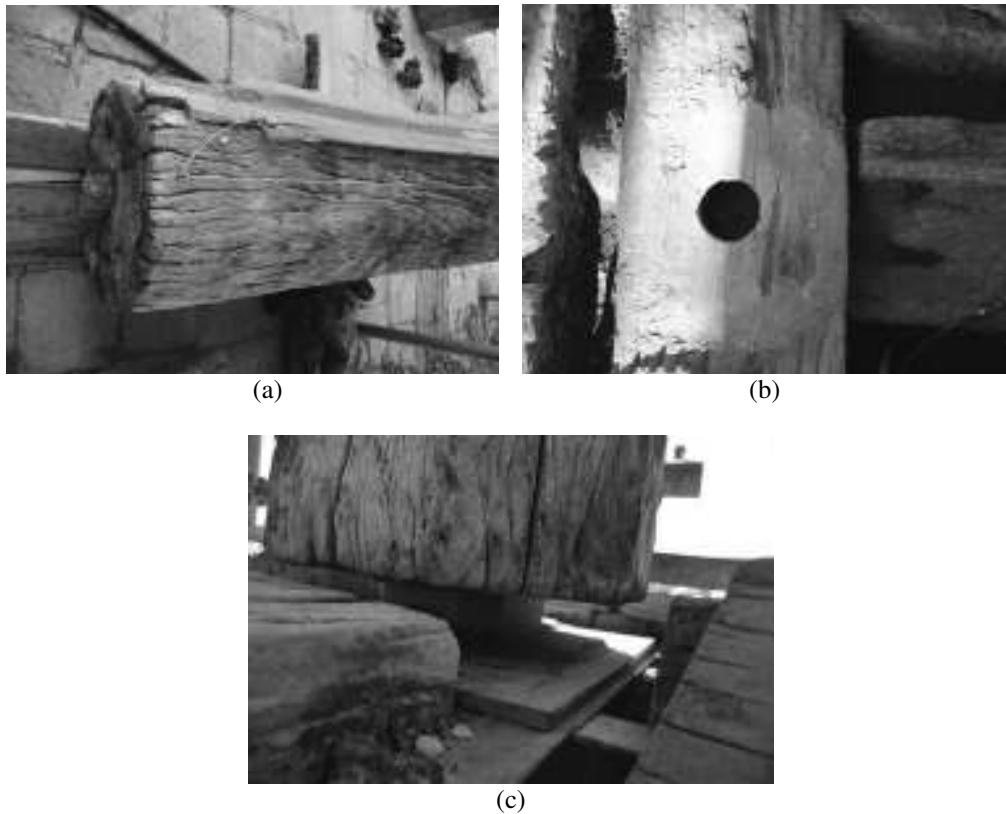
(a) The original tenon and, (b) mortise connection making a simple connection between the column and lower base, (c) new rigid connection between the steel core of the column and the new reinforced concrete compromising the authenticity of structural behaviour
